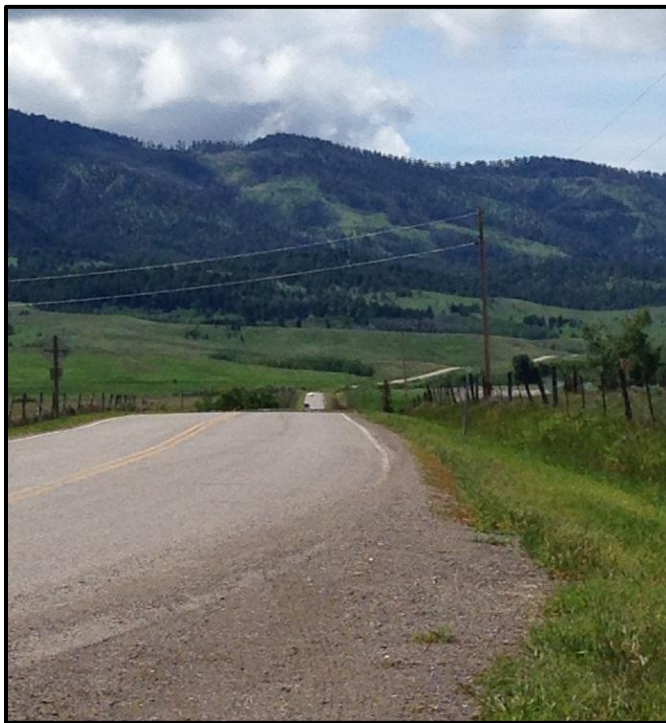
Looking at a deteriorated roadway due to a plugged culvert on an unnamed tributary to Cache Creek. RP 24.7.
